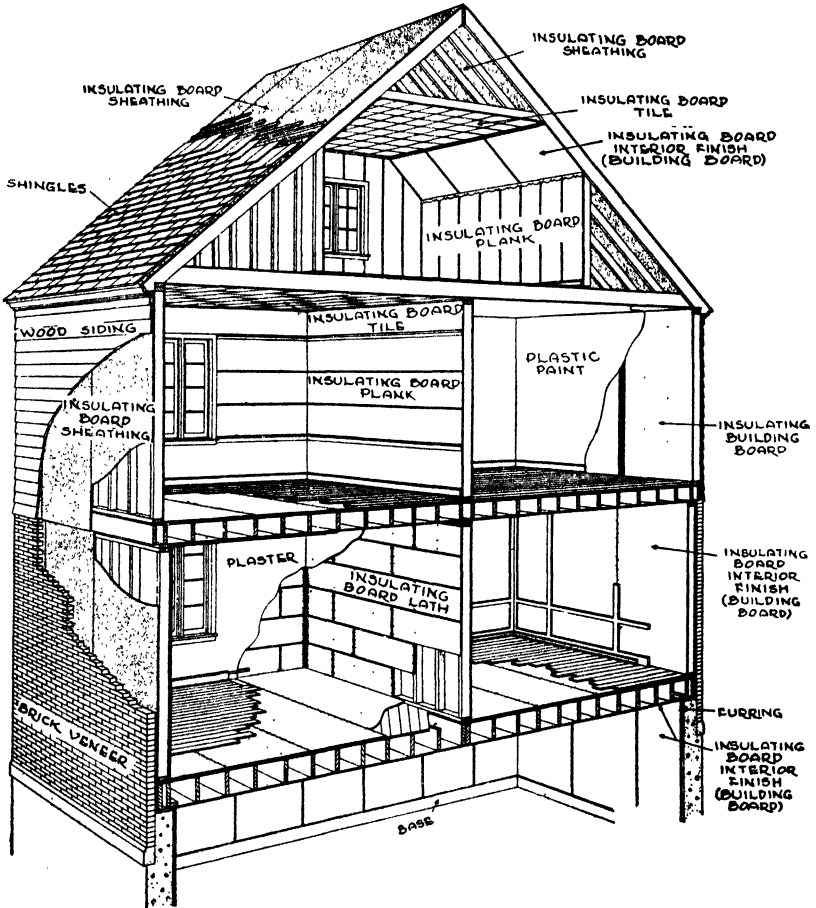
Section of Building Showing Typical Uses of Structural Insulating Board
